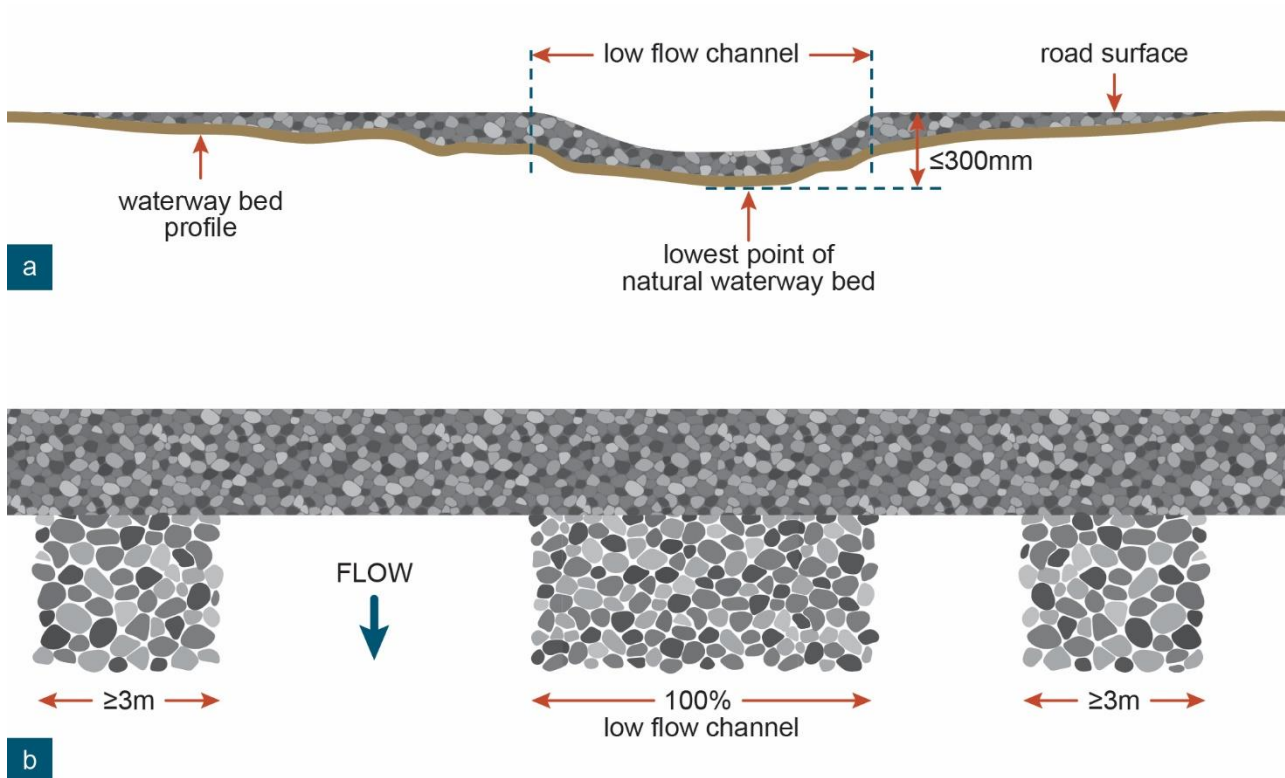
Low level crossing option 2, incorporating low flow channel – purple and red waterways (a) cross-section of waterway (b) plan view
